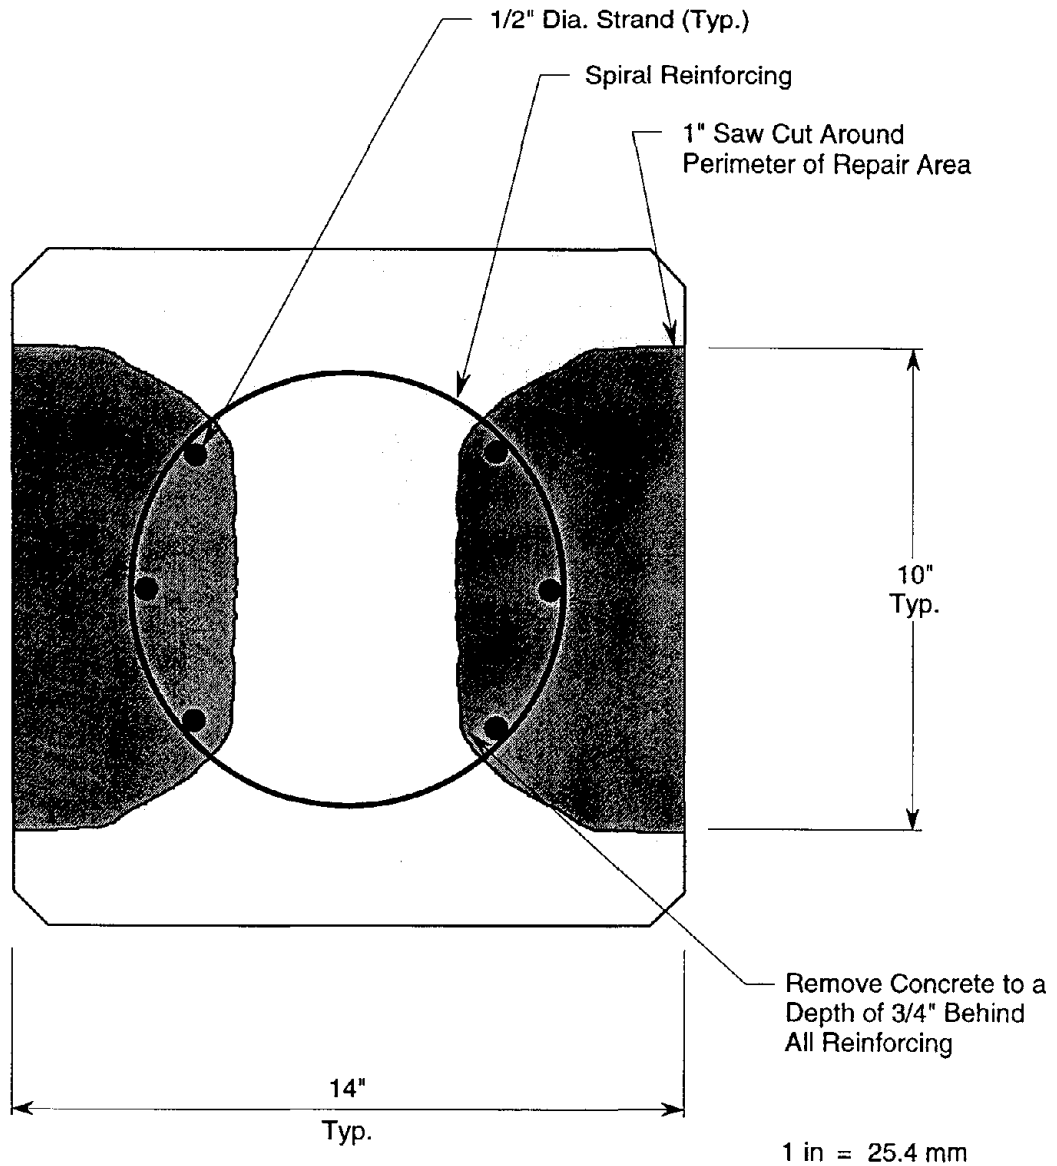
Elevation view of repair area details for pretensioned pile specimens.
